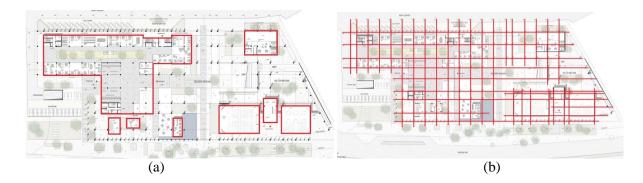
Efeler Town Hall (a) Ground floor plan, (b)Axle system
